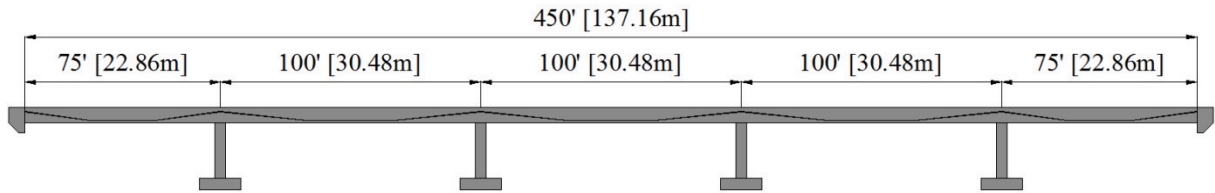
Elevation of prototype structure [Megally et al., 2002]
